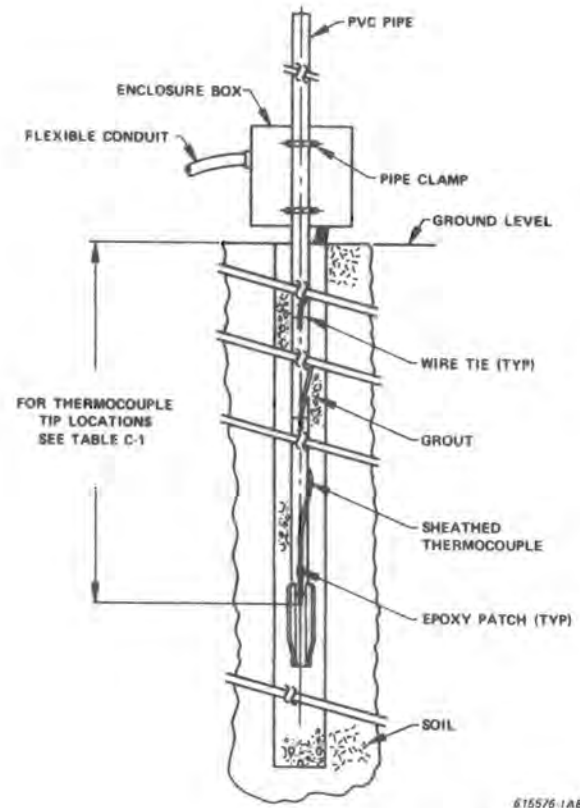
Electrically Heated Drywell Test Instrumentation Well Configuration
